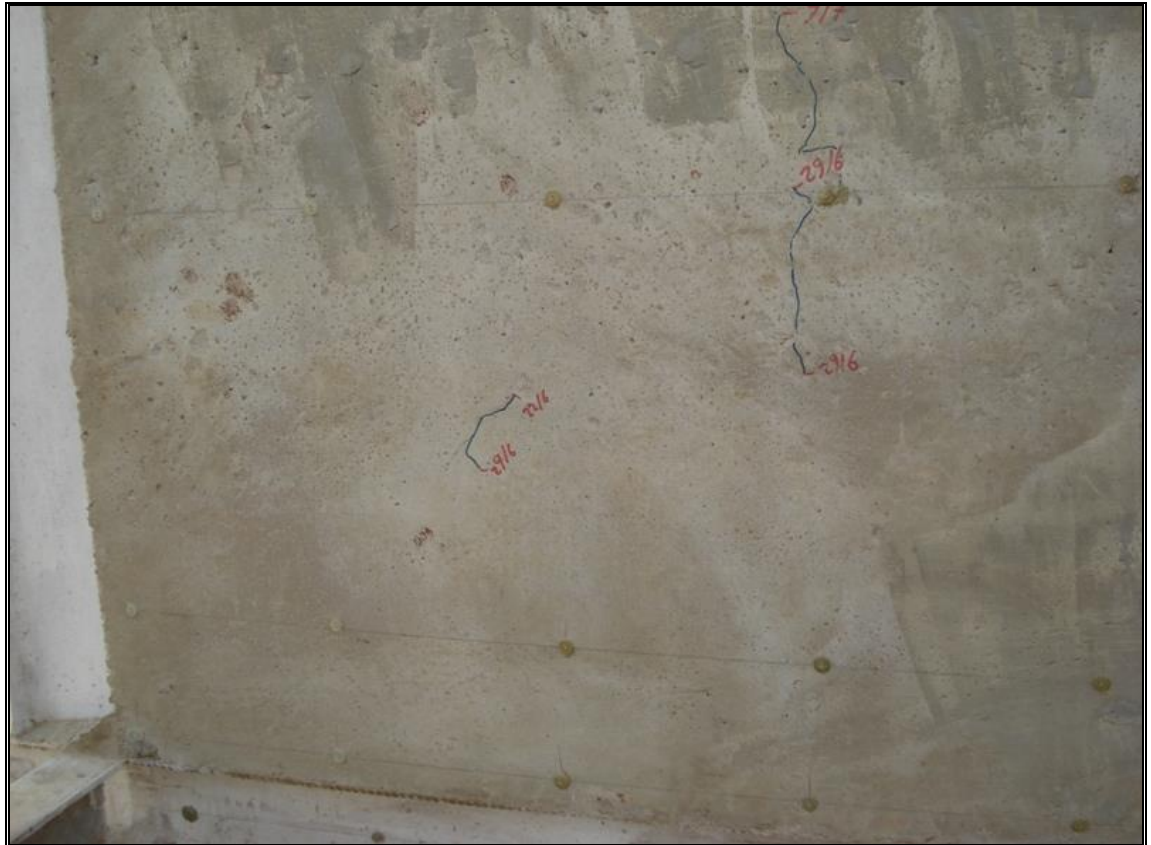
Final cracking pattern of first quarter of wall (4S)
